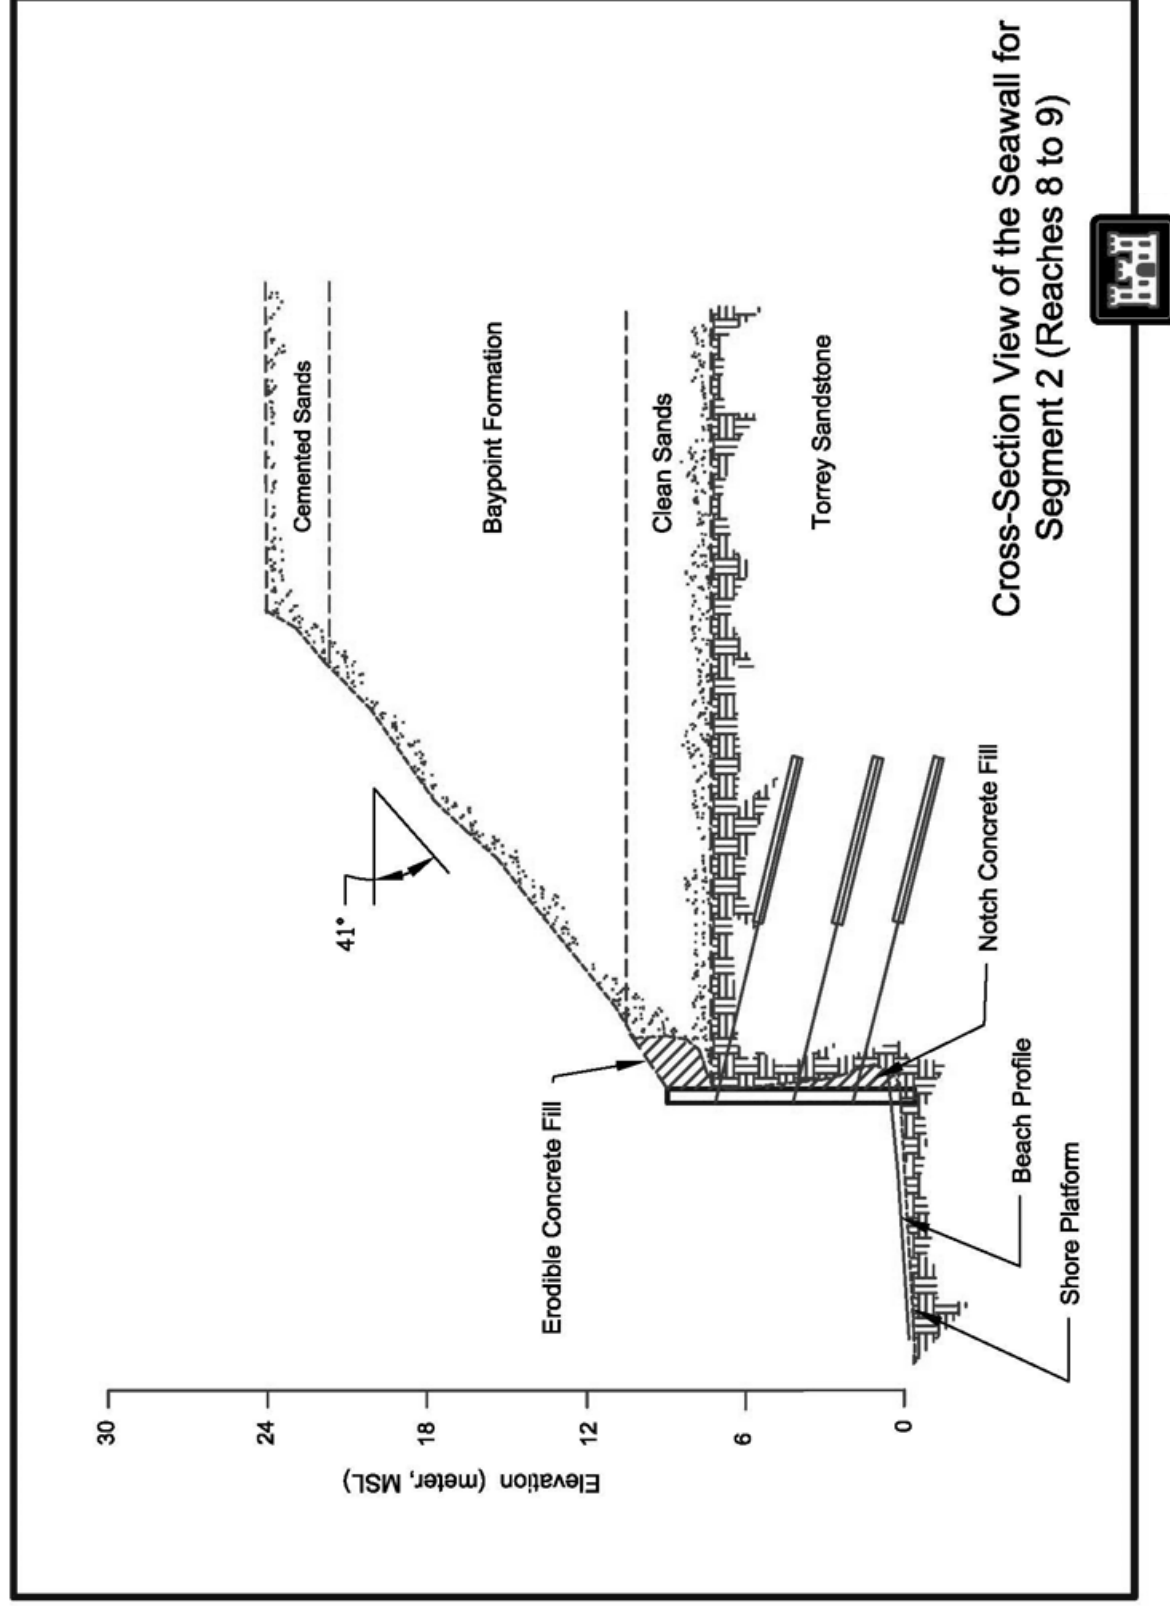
Cross-Section View of the Seawall for Segment 2 (Reaches 8 to 9)
